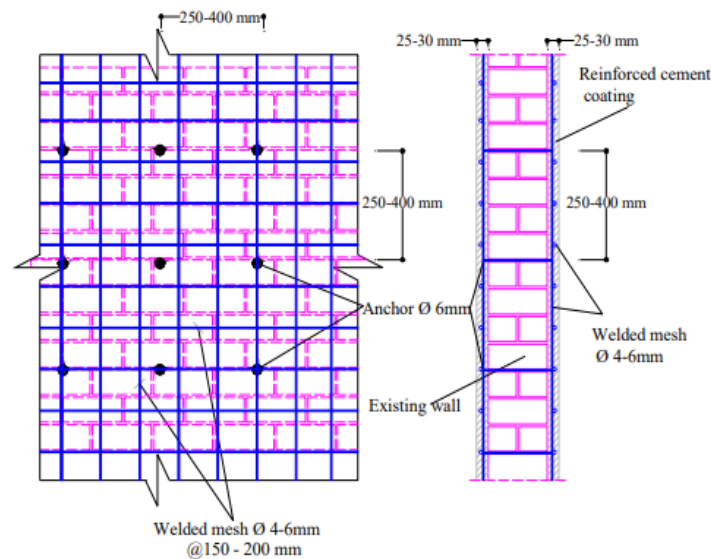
Pattern and detail of the steel reinforcement (Elgawady & Lestuzzi, 2004)
